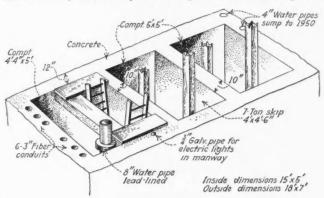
Horizontal section of No. 5 shaft, with dimensions
